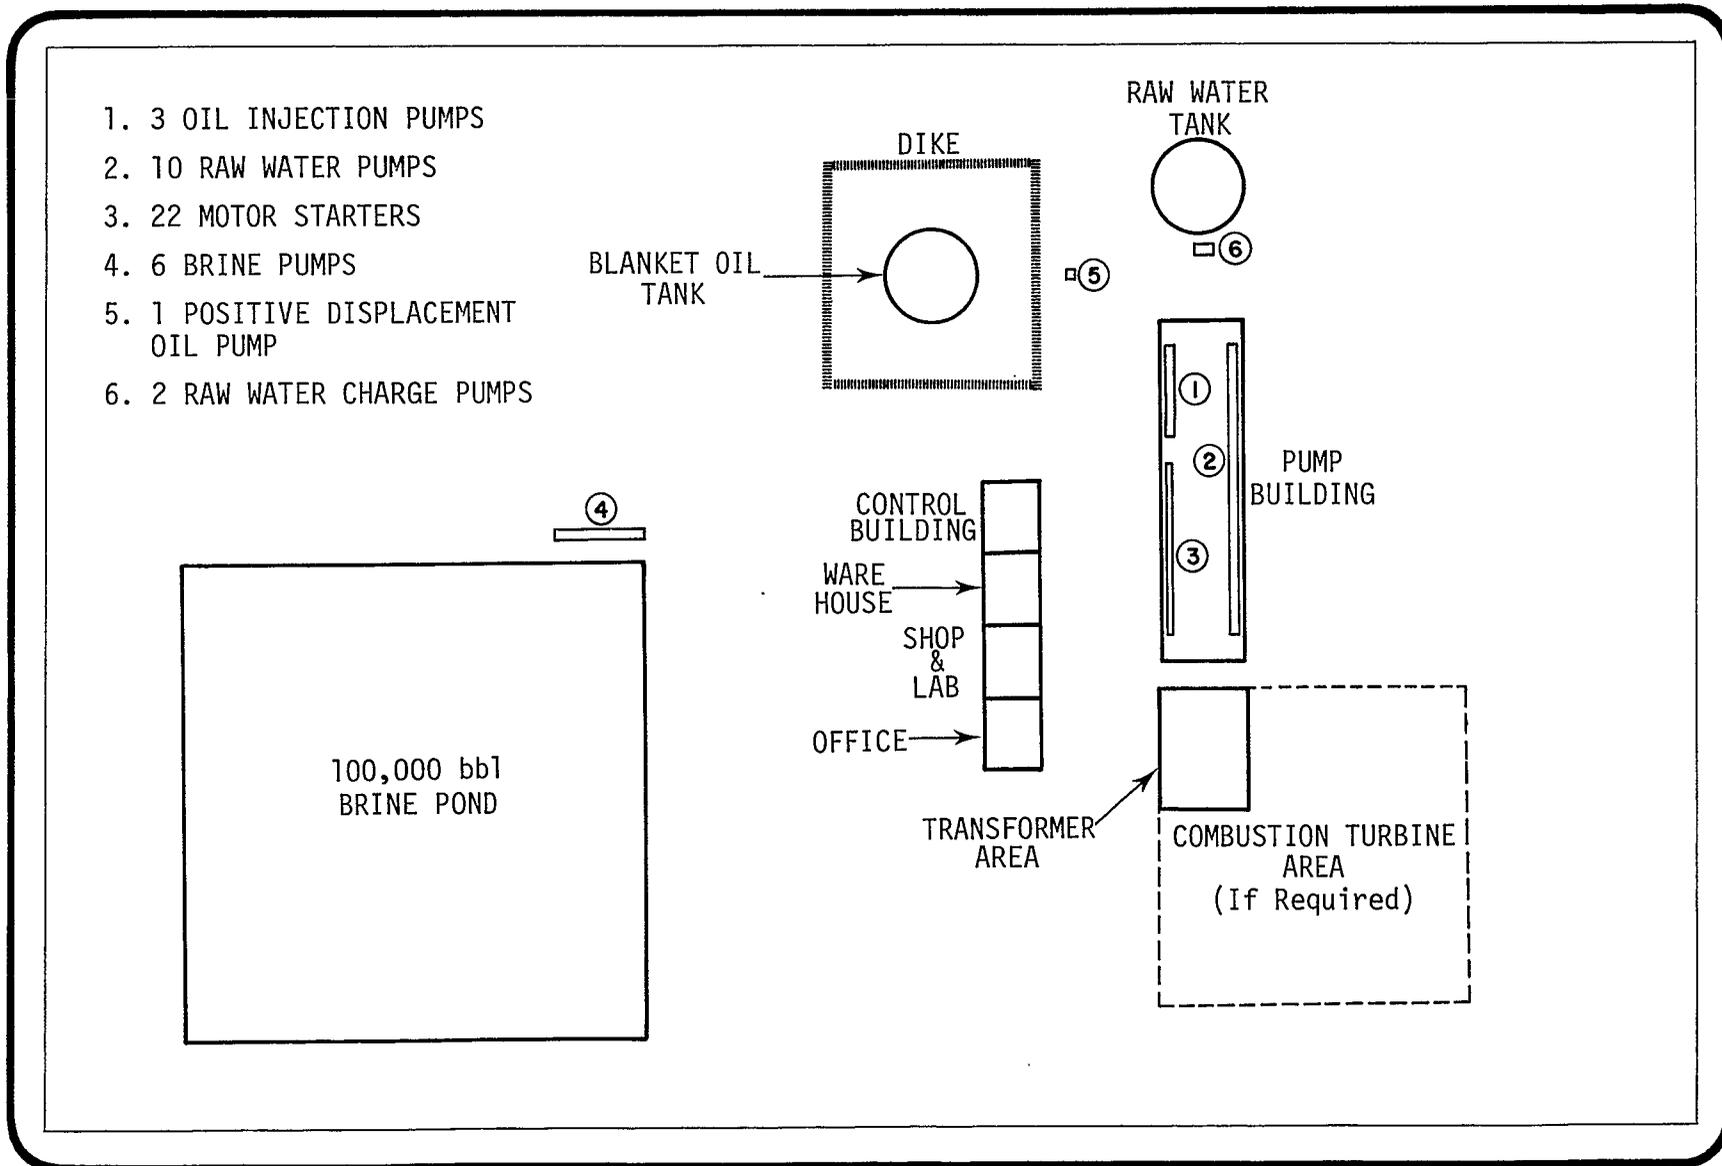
Plant area layout - Allen dome candidate SPR storage site (alternative site).
